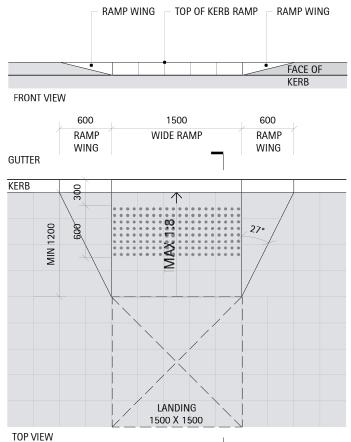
Kerb Ramp Layout: 1500 Wide
